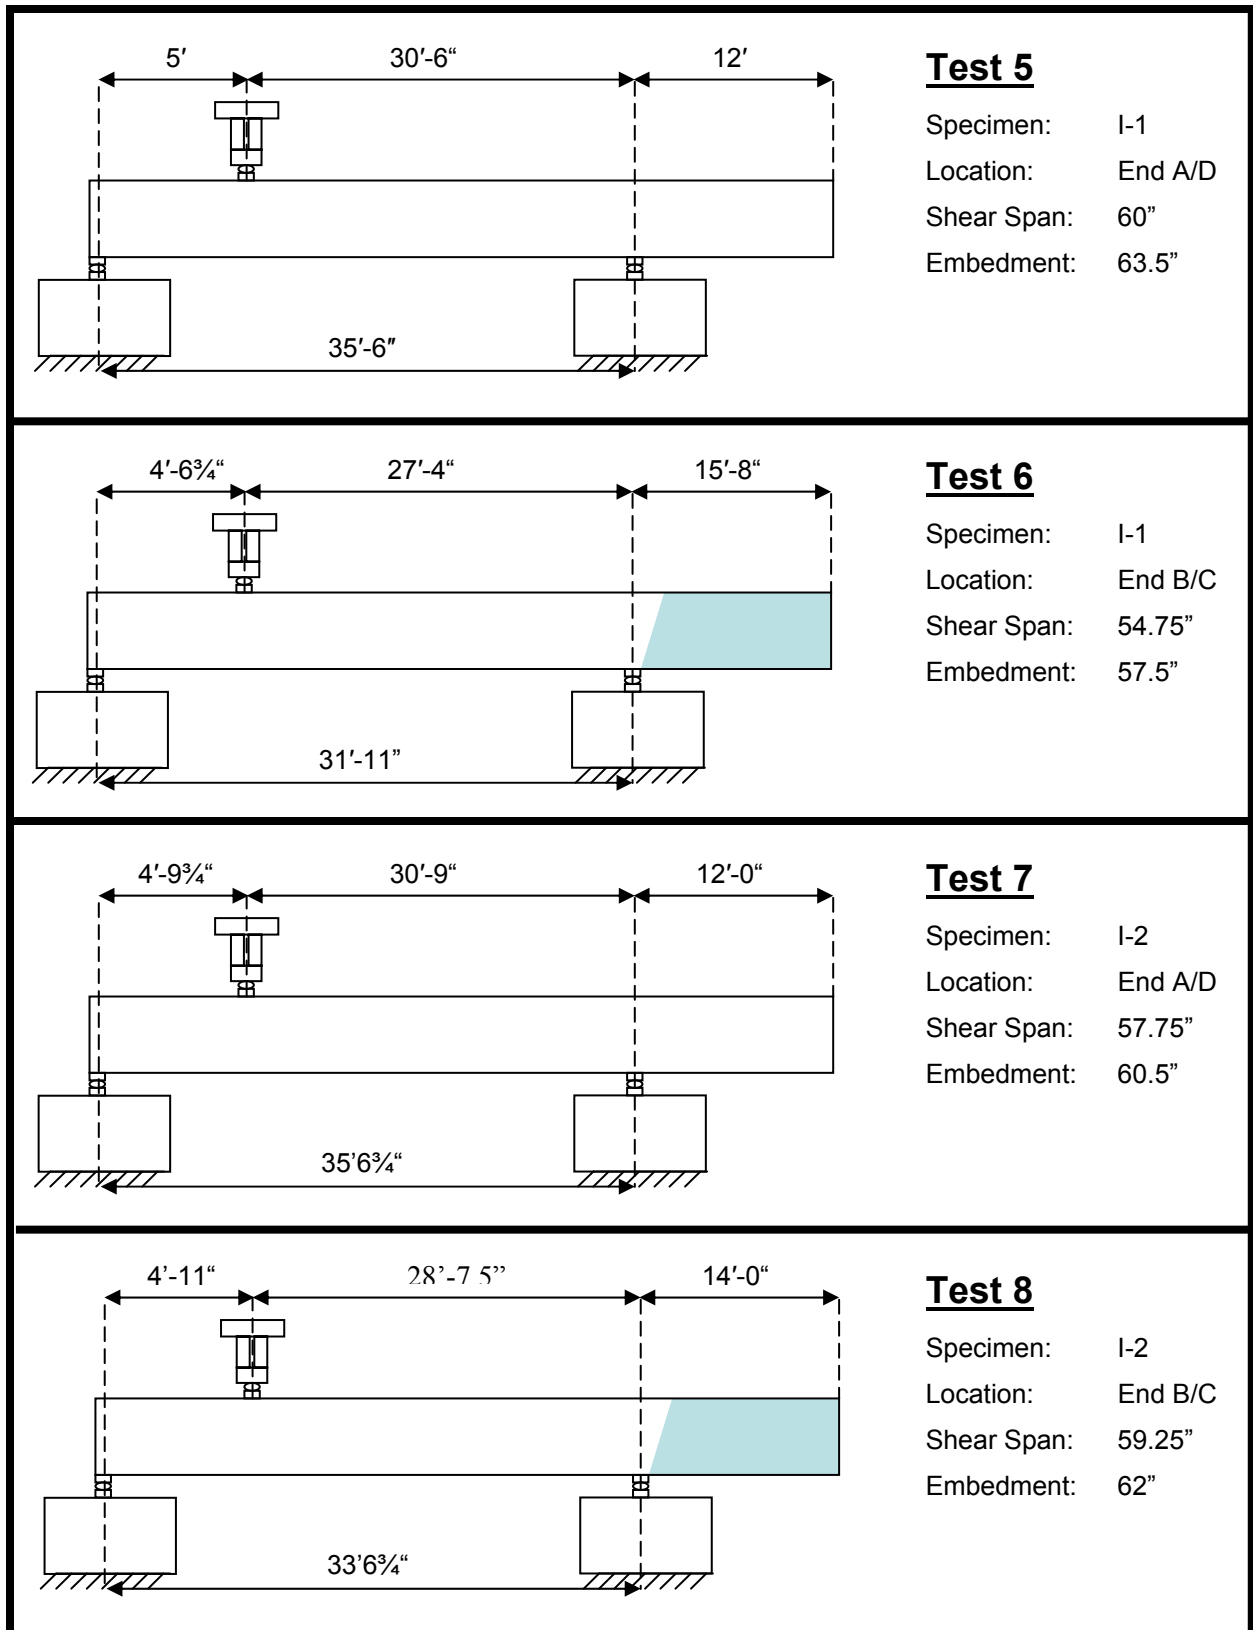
Support and load positions for I-girder tests (not to scale).
